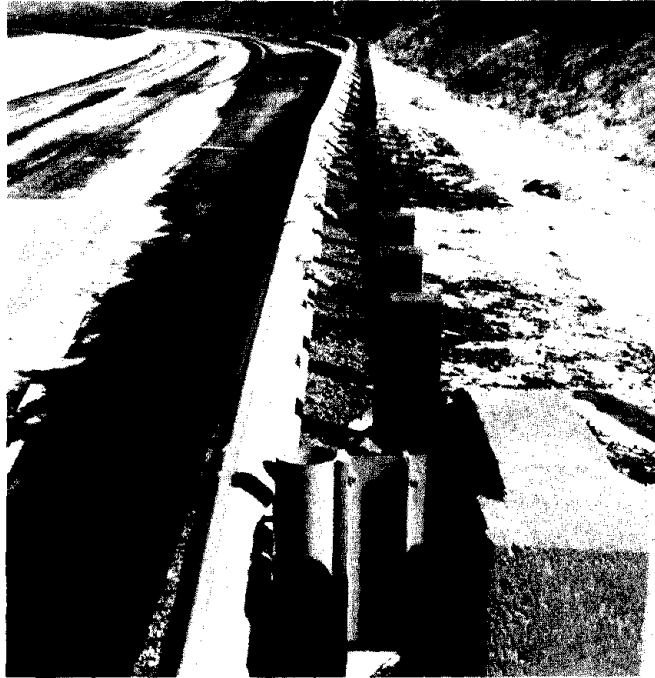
SERB begins at bridge and extends 1,650 feet.
